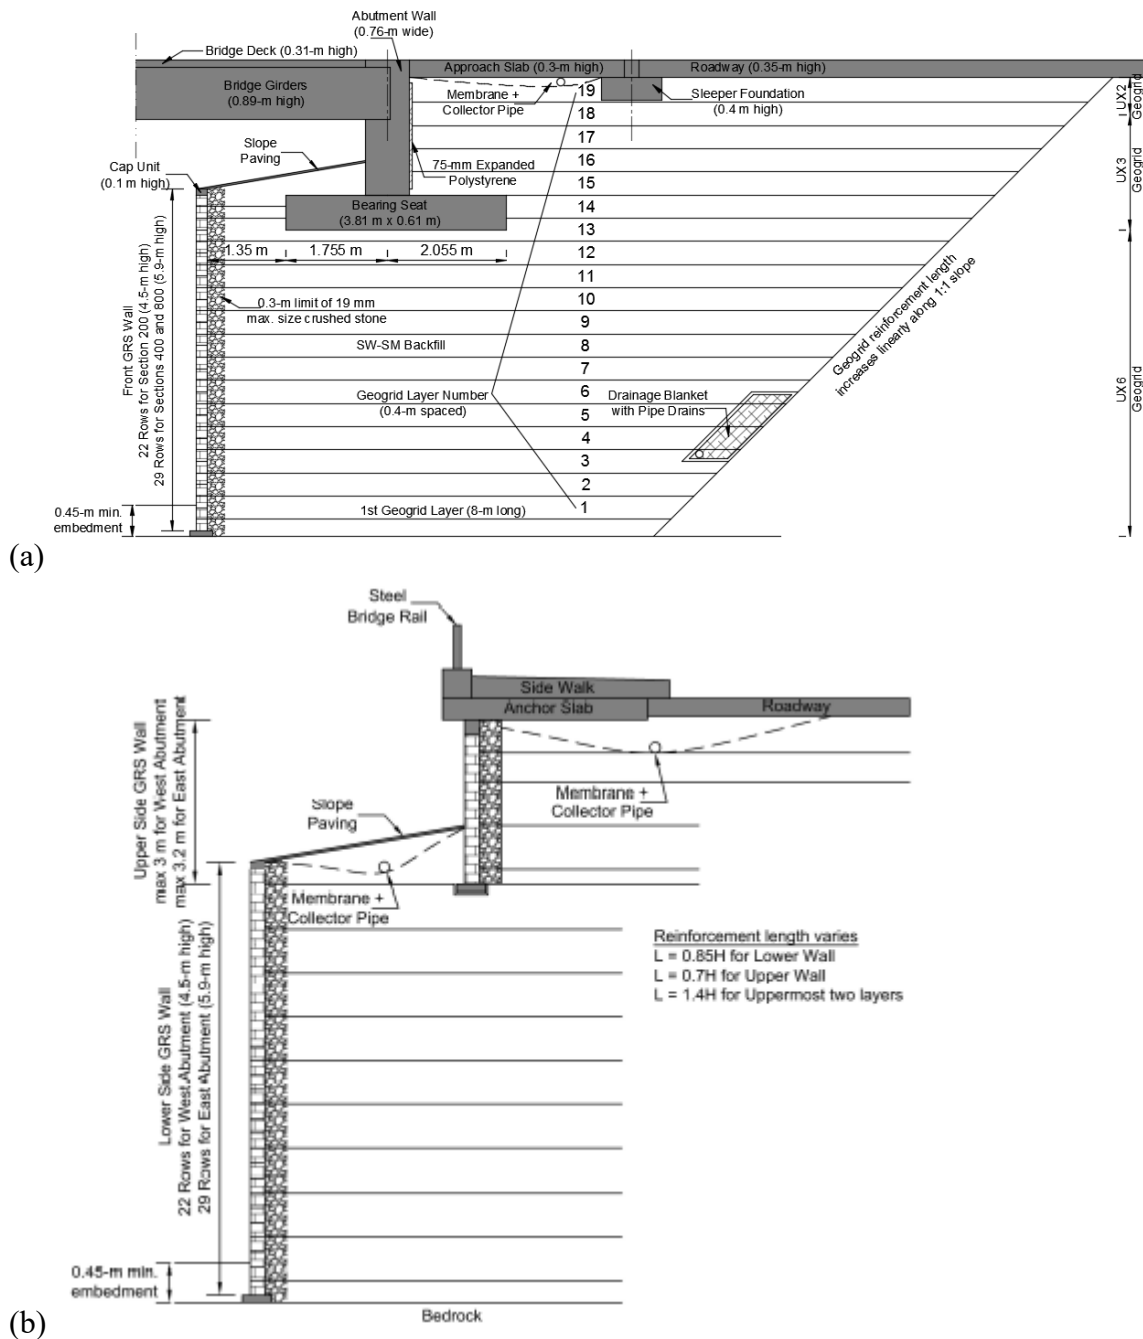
Typical cross-section of the Founders/Meadows Bridge abutment: (a) Sections 200, 400, and 800 (redrawn after Abu-Hejleh et al. 2002); and (b) Section 300 and 900 (redrawn after Abu-Hejleh et al. 2001a).
